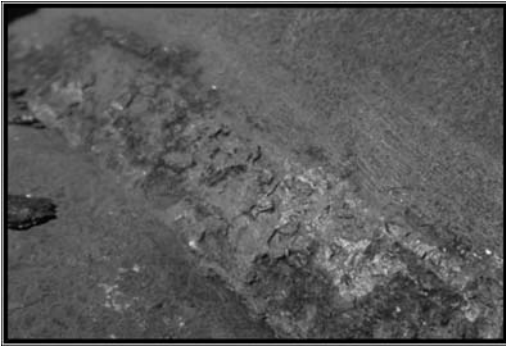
Details of weld corrosion DP1 Jacket.
